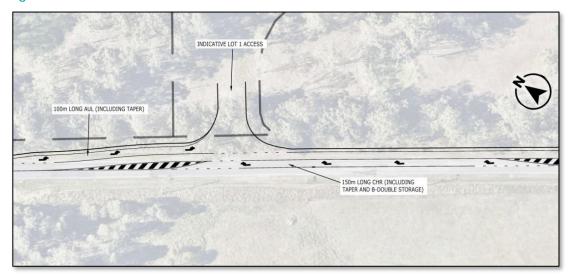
GREENBANK ROAD ACCESS FUNCTIONAL LAYOUT
